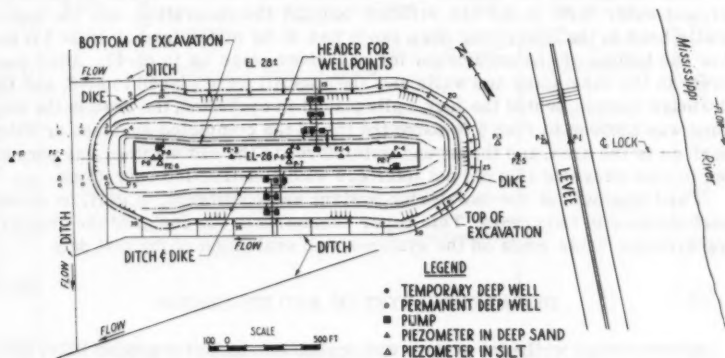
PLAN OF EXCAVATION AND DEWATERING SYSTEM
